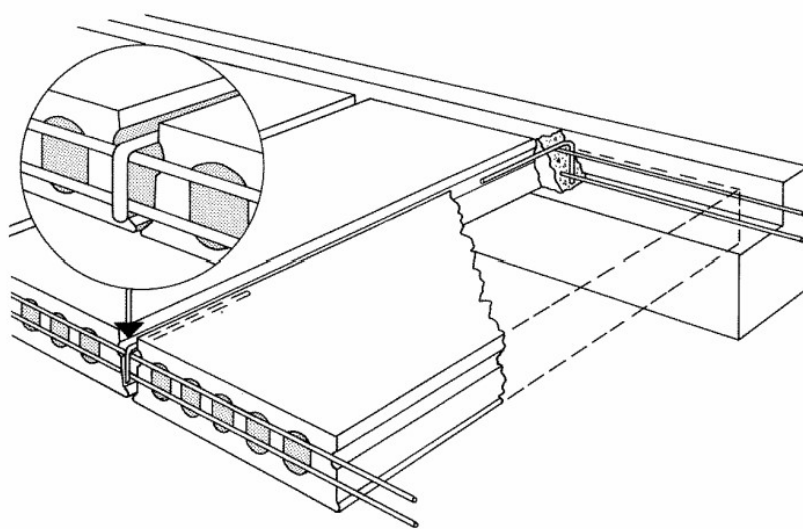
Connection of longitudinal rebars with transverse resisting steel rebars, voids filled with grout (Engström et al., 2008).
